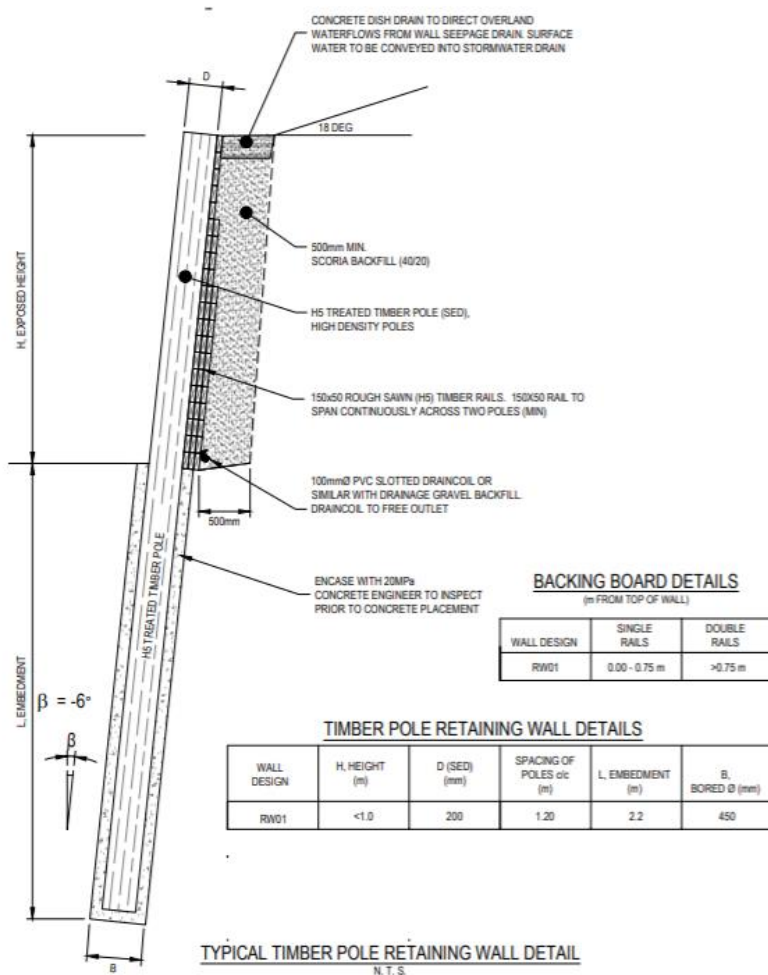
Haigh Workman indicative design of retaining wall (see Appendix D)
